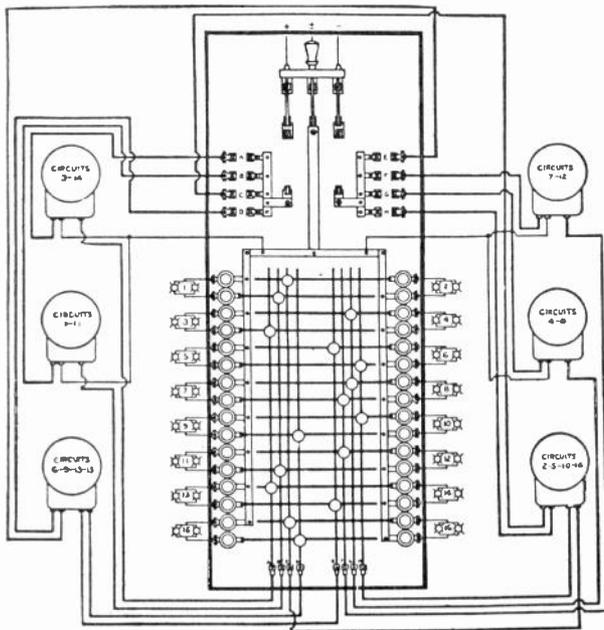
Wiring diagram for modern fuse and meter cabinet.
